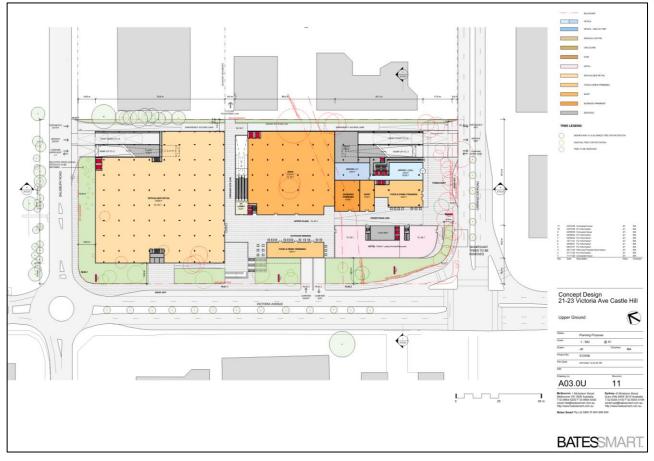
Proposed Architectural Plan (Upper Ground Level)
